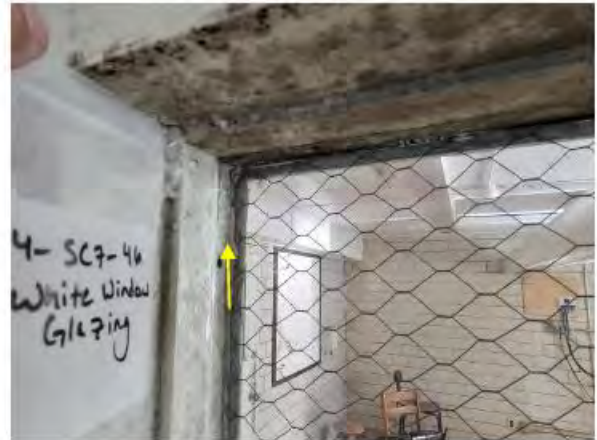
Photo of asbestos containing white window glazing, HA 14.
